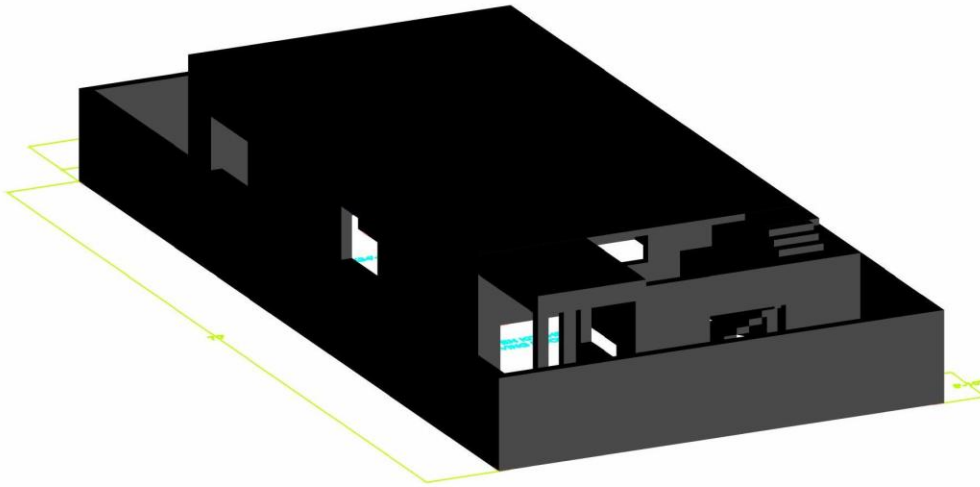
Front-facing isometric view of the building massing, showing window and door openings.
